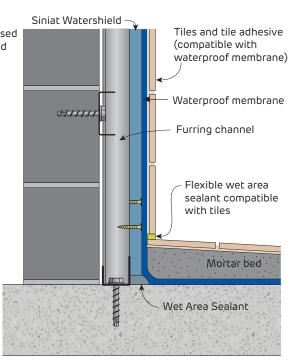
Shower over Masonry Wall Class 3 membrane shown - Section
